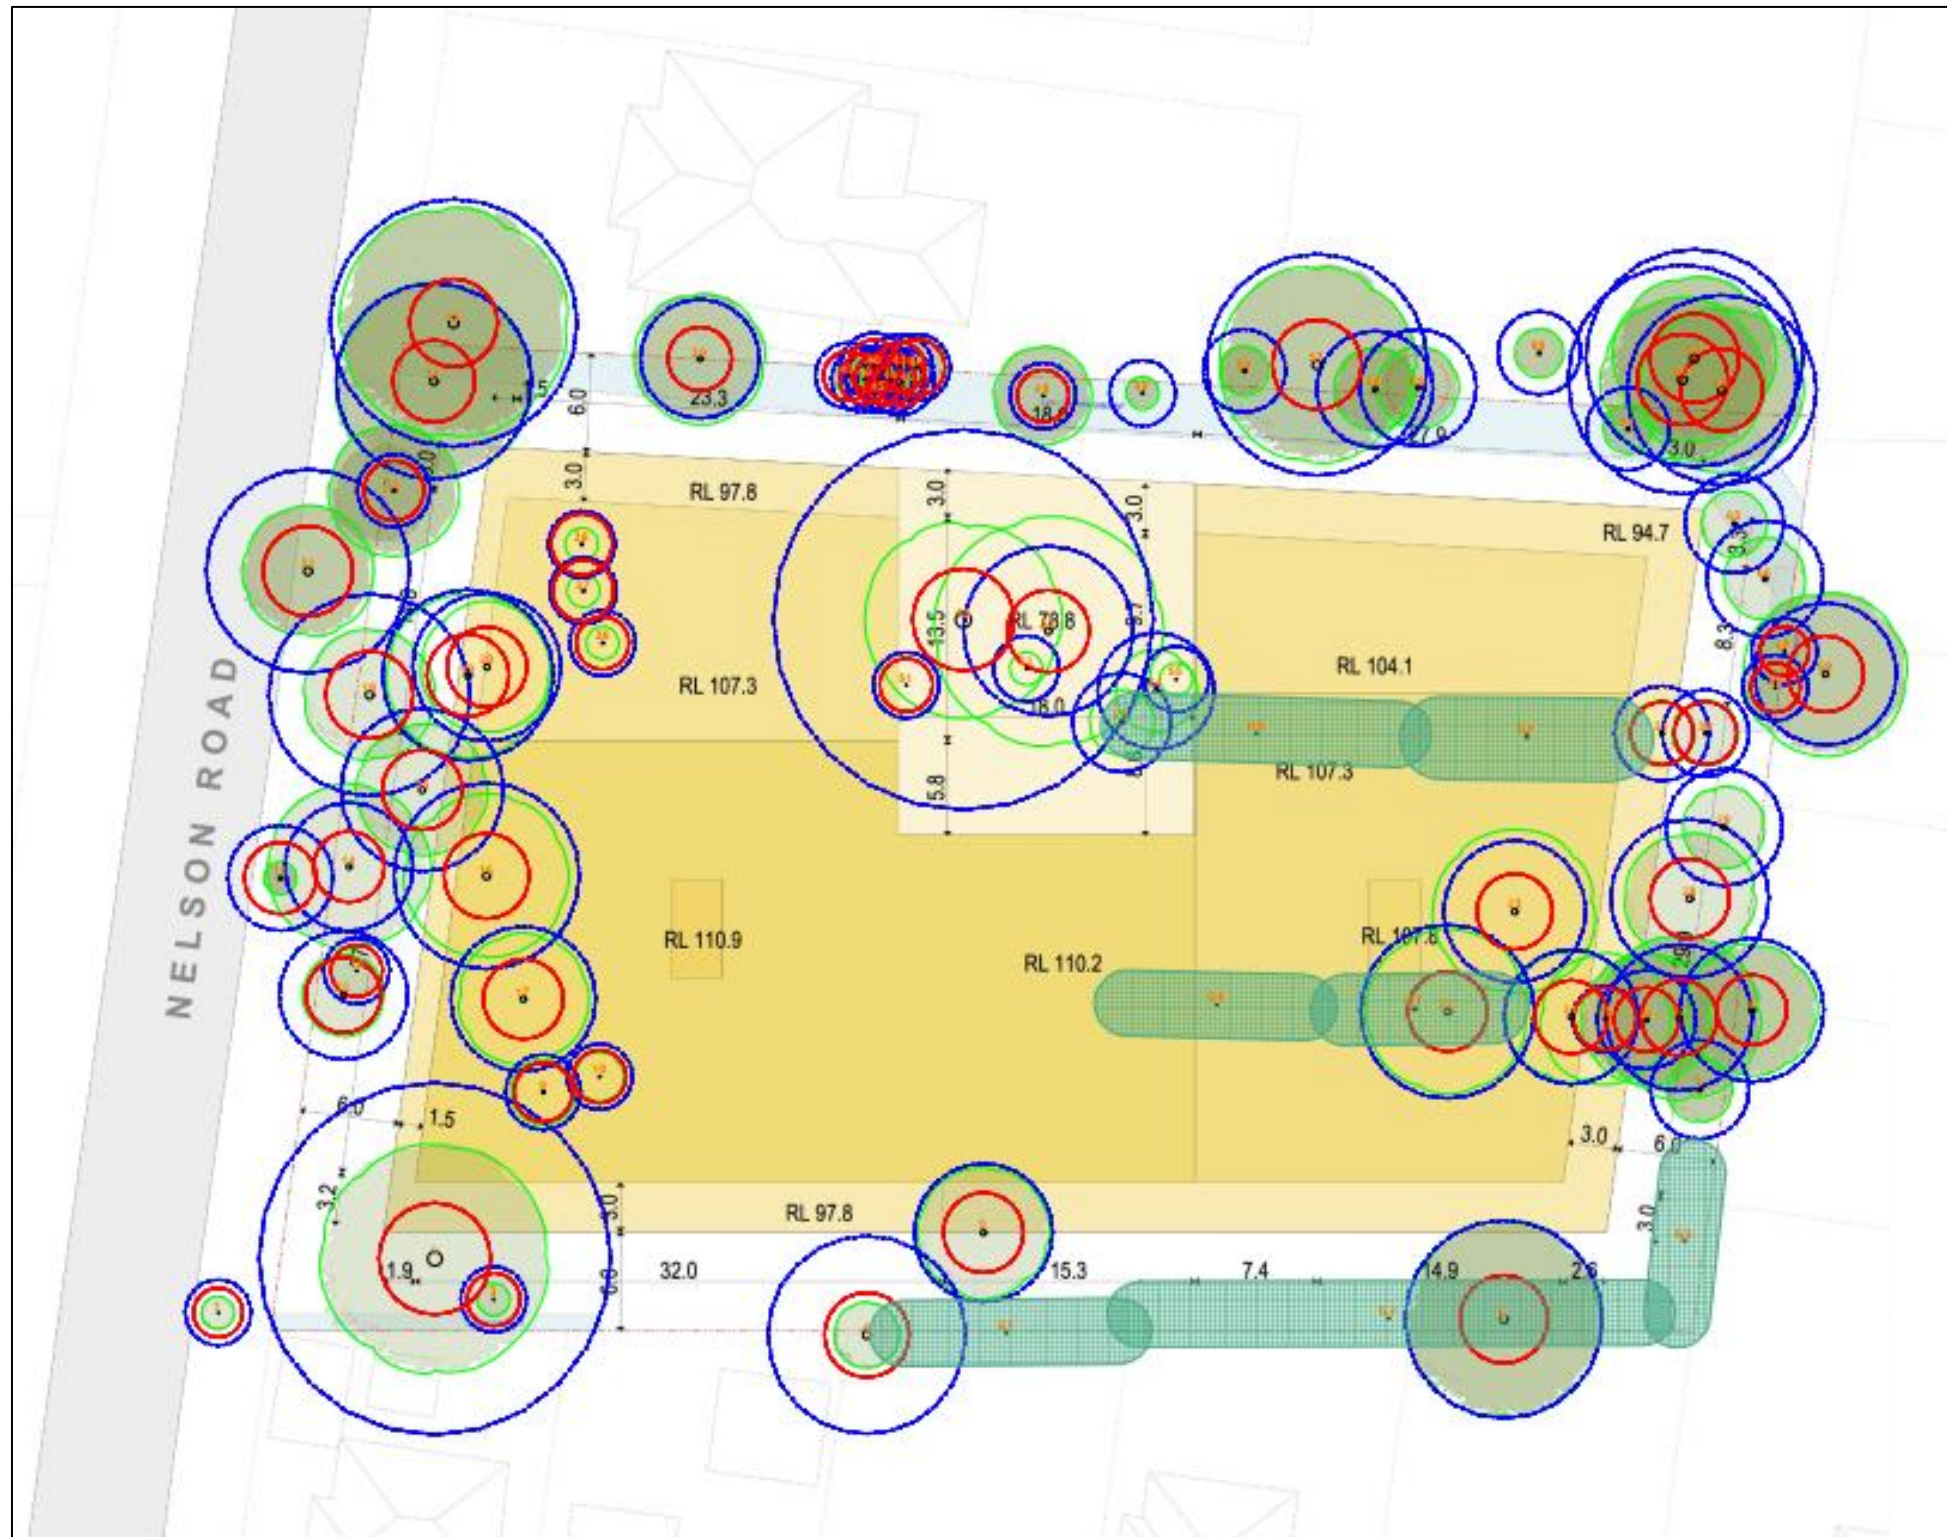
Proposed site plan showing the extent of the footprint and existing trees.
